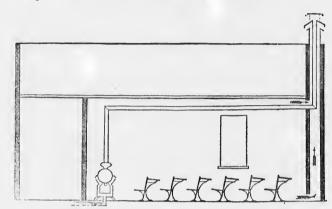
Section of Single School-House, showing a simple mode of Heating and Ventilation.
